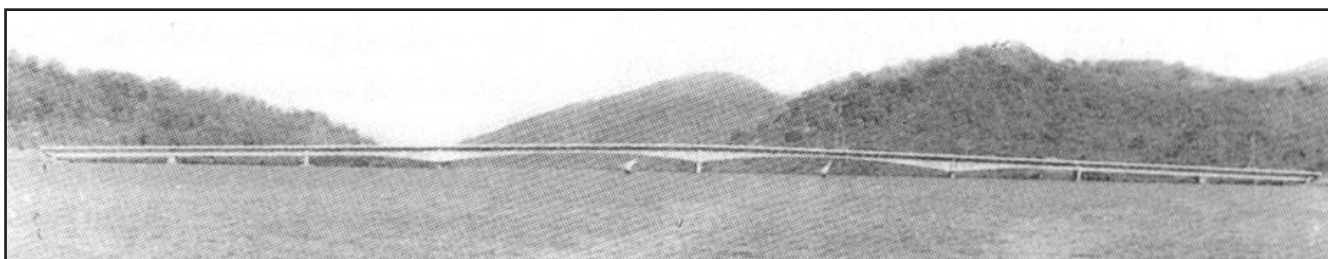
Bassein Creek Bridge near Mumbai with a continuous deck of 361.6 m
